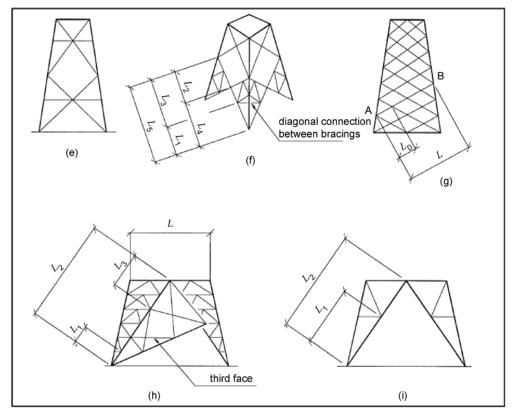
/DE.3 – Application of secondary and spatial bracing systems
